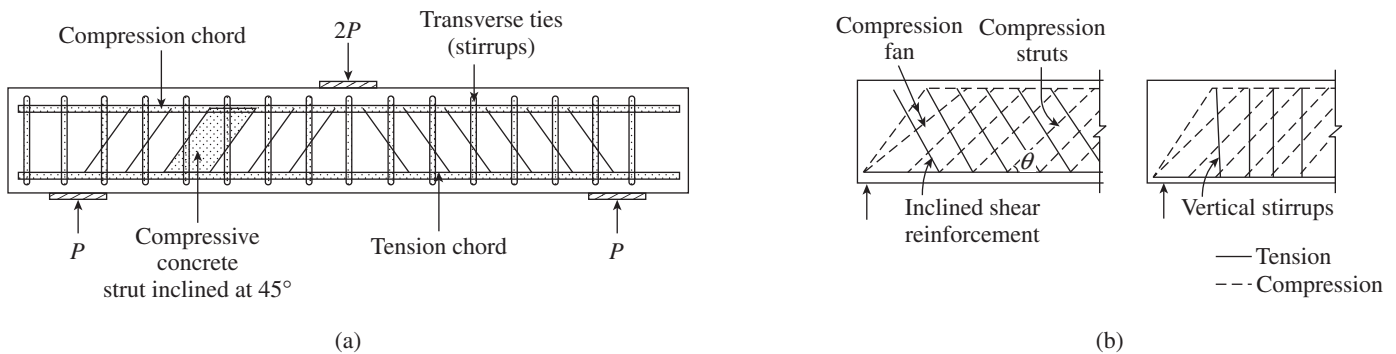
Truss models for beams with web reinforcement (a) Ritter–Mörsch truss model (b) Variable angle truss model
